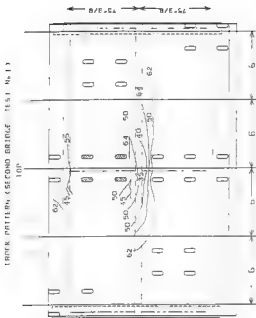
Top Cracking Pattern (Second Bridge - Test No 1)
